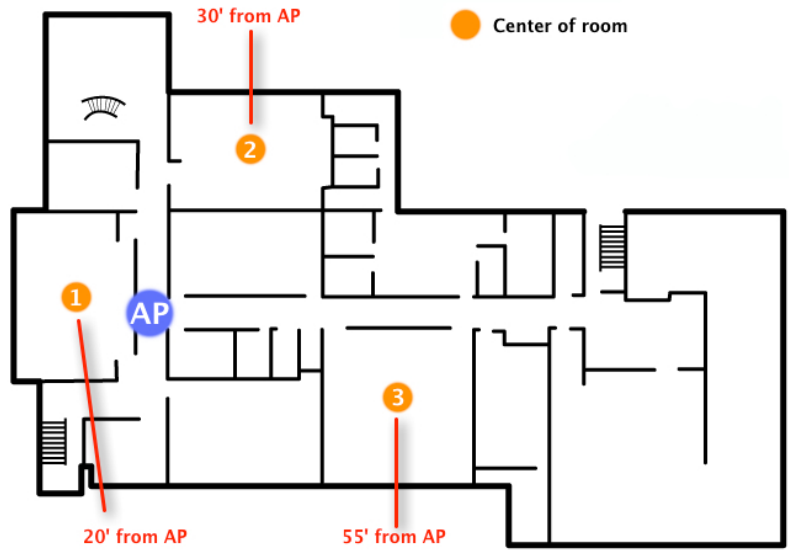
Floor plan of Hinds Hall with locations of Test 2 APs
